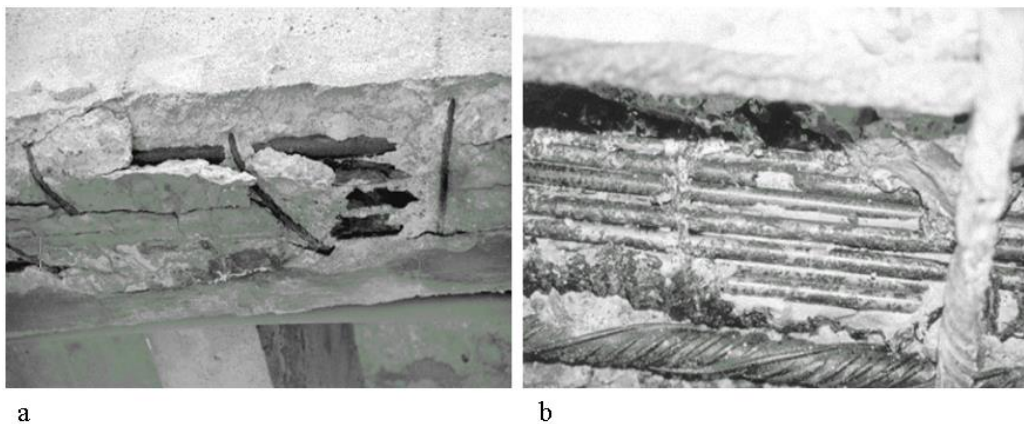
Corrosion of RC bridges girders; a) Concrete spalling because of carbonation or chlorides; b) high corroded steel wire because of chloride-induced corrosion [13].
